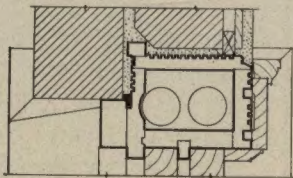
8-inch brick or tile wall with lath and plaster on 1/2-inch furring. Note position of anchor strip to give 5 1/4-inch jamb width.
